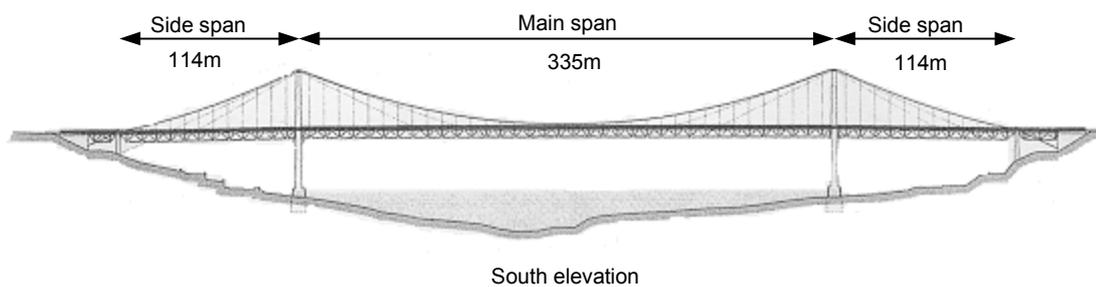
Longitudinal elevation of the Tamar Bridge
